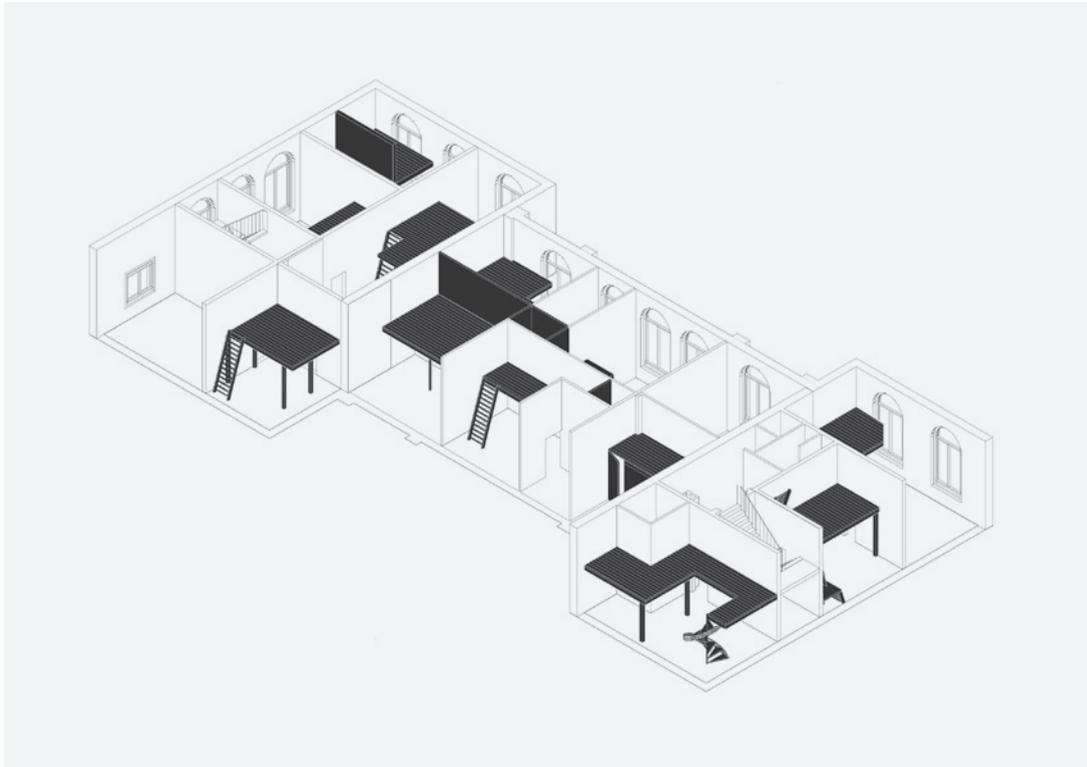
Poortgebouw, axonometric drawing of the first floor with mezzanines.
